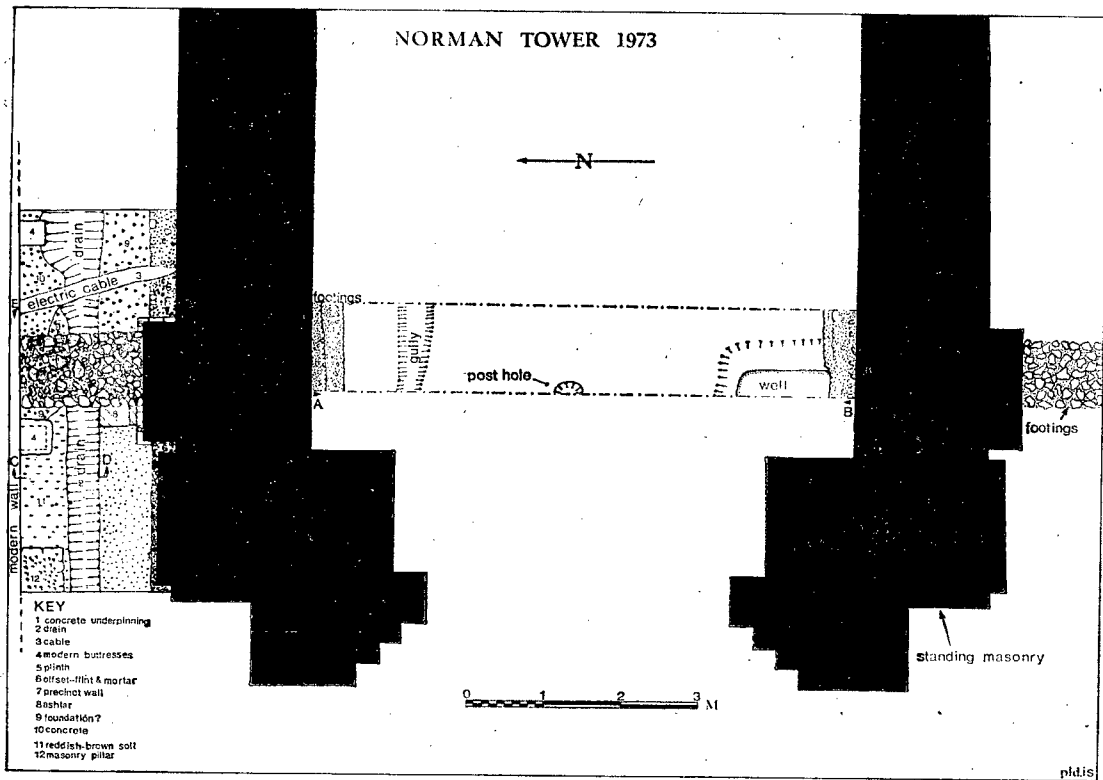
Bury St. Edmunds, Norman Tower, plan showing excavations, 1973.
